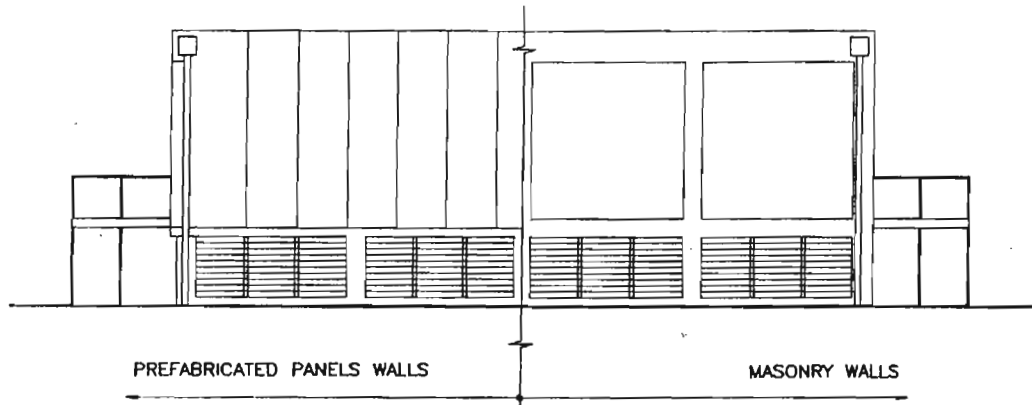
10m WIDE SUBSTATION BUILDING--PLANS
